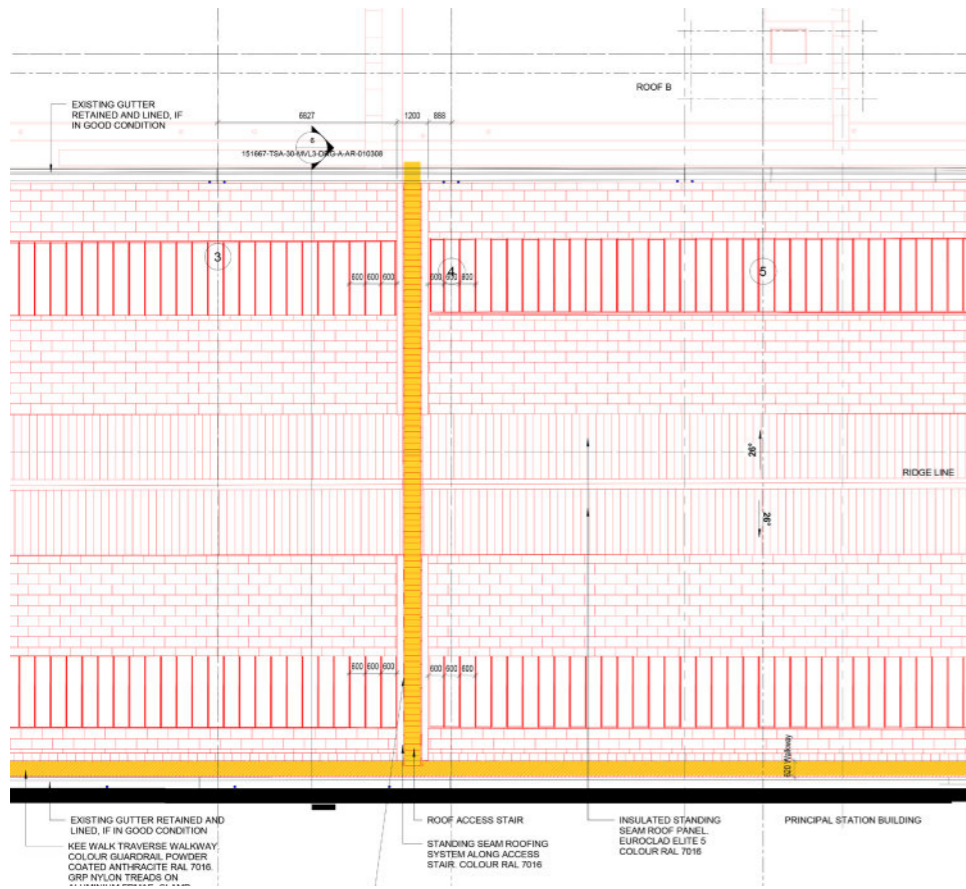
Roof A plan, showing access walkway highlighted
